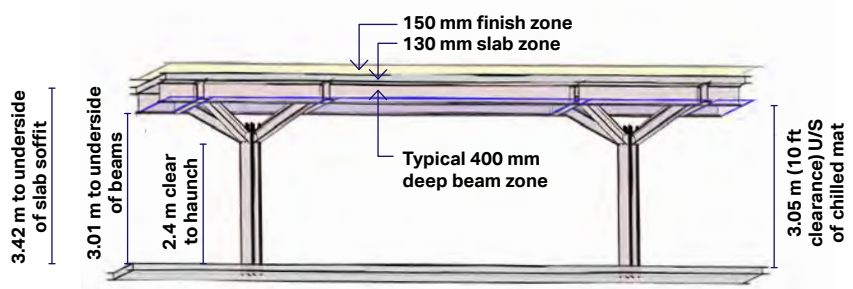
Tree column floor system developed by Make Architects and Arup – effectively shortening the span
